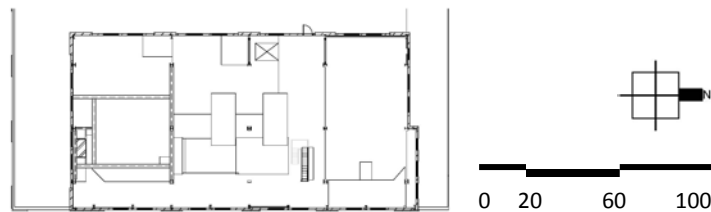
Seventh Floor Plan. Alley Poyner Macchietto Architecture, 2014.
